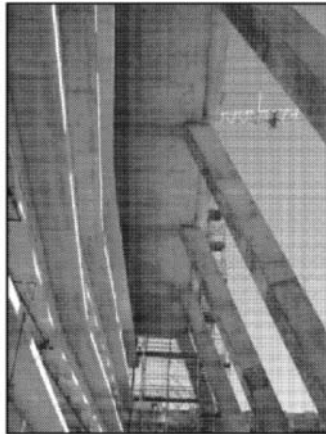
Sloping columns: Connecting at Level 6 of the building, the columns frame a dramatic atrium for the office tower. (Photo courtesy of Steve Ratchye)
